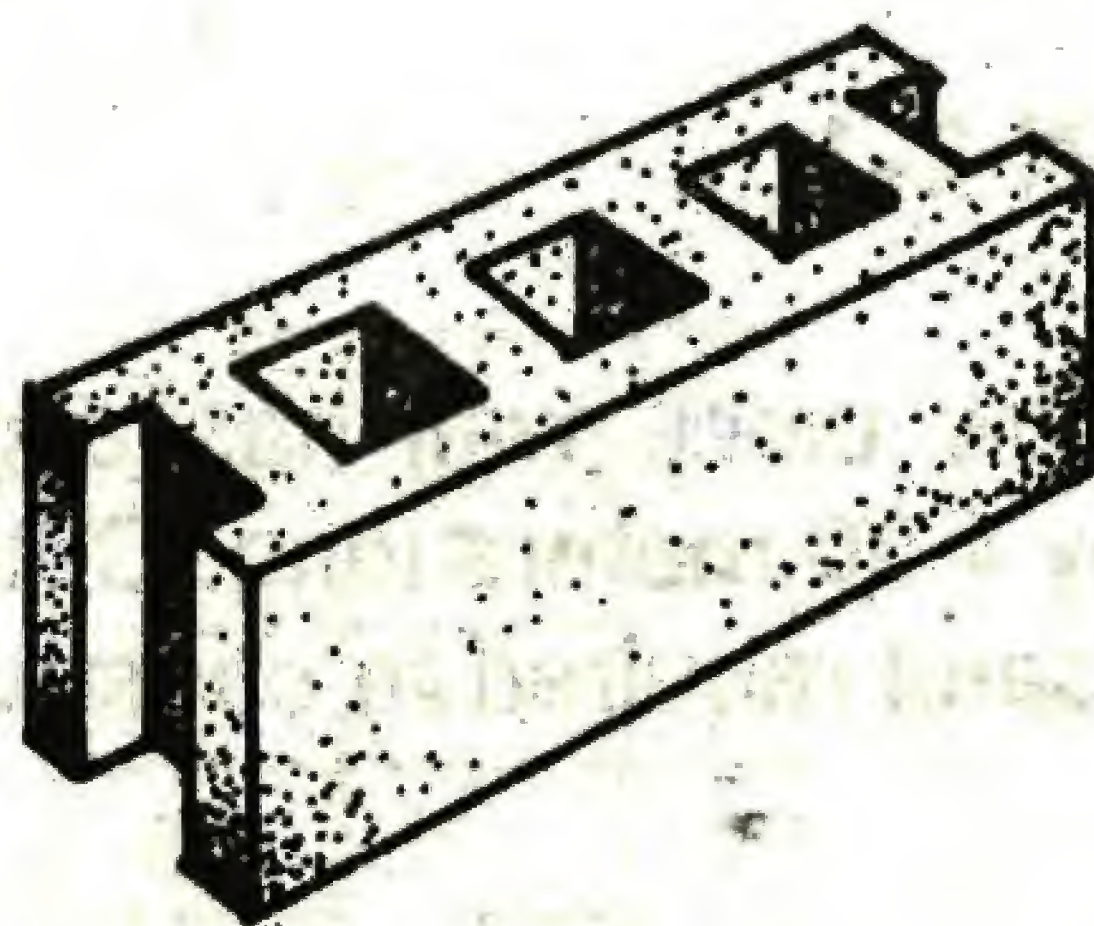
CONCRETE HOLLOW BLOCK
